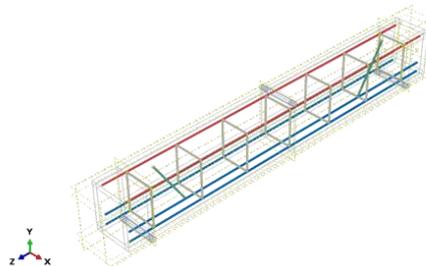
Reinforced concrete for strengthening beam with 2 CFRP inclined (B200-E10-I)
